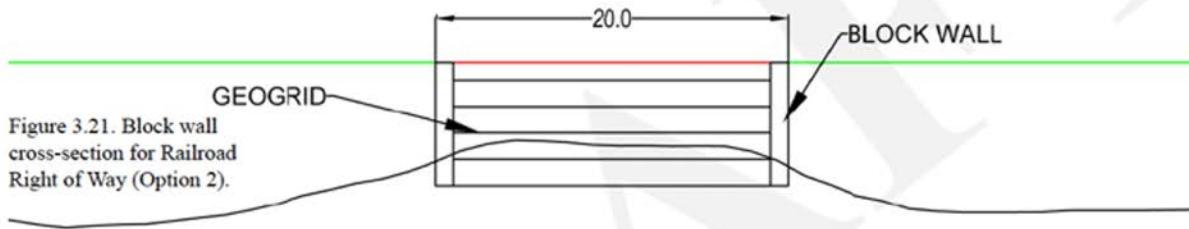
Block wall cross-section for Railroad Right of Way (Option 2).
